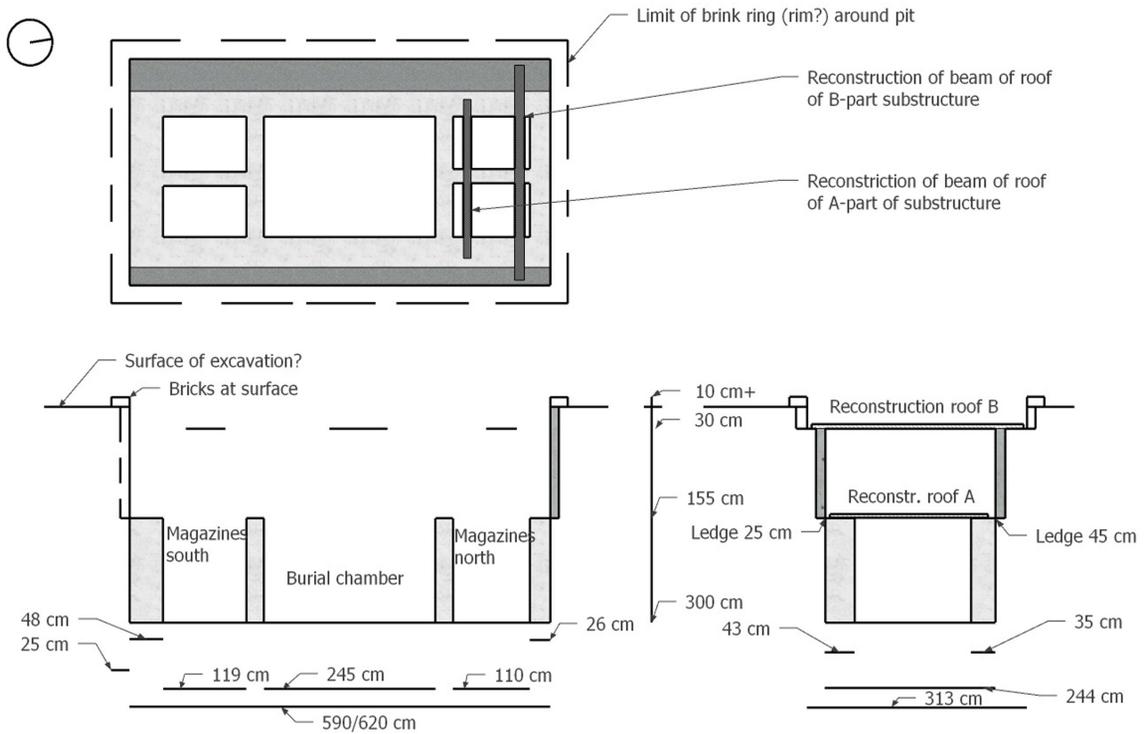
A drawing of the substructure of tomb M25: top plan and sections (drawing M. Ormeling, based on Klasens’ unpublished Field book 1959 III, pages undated)
